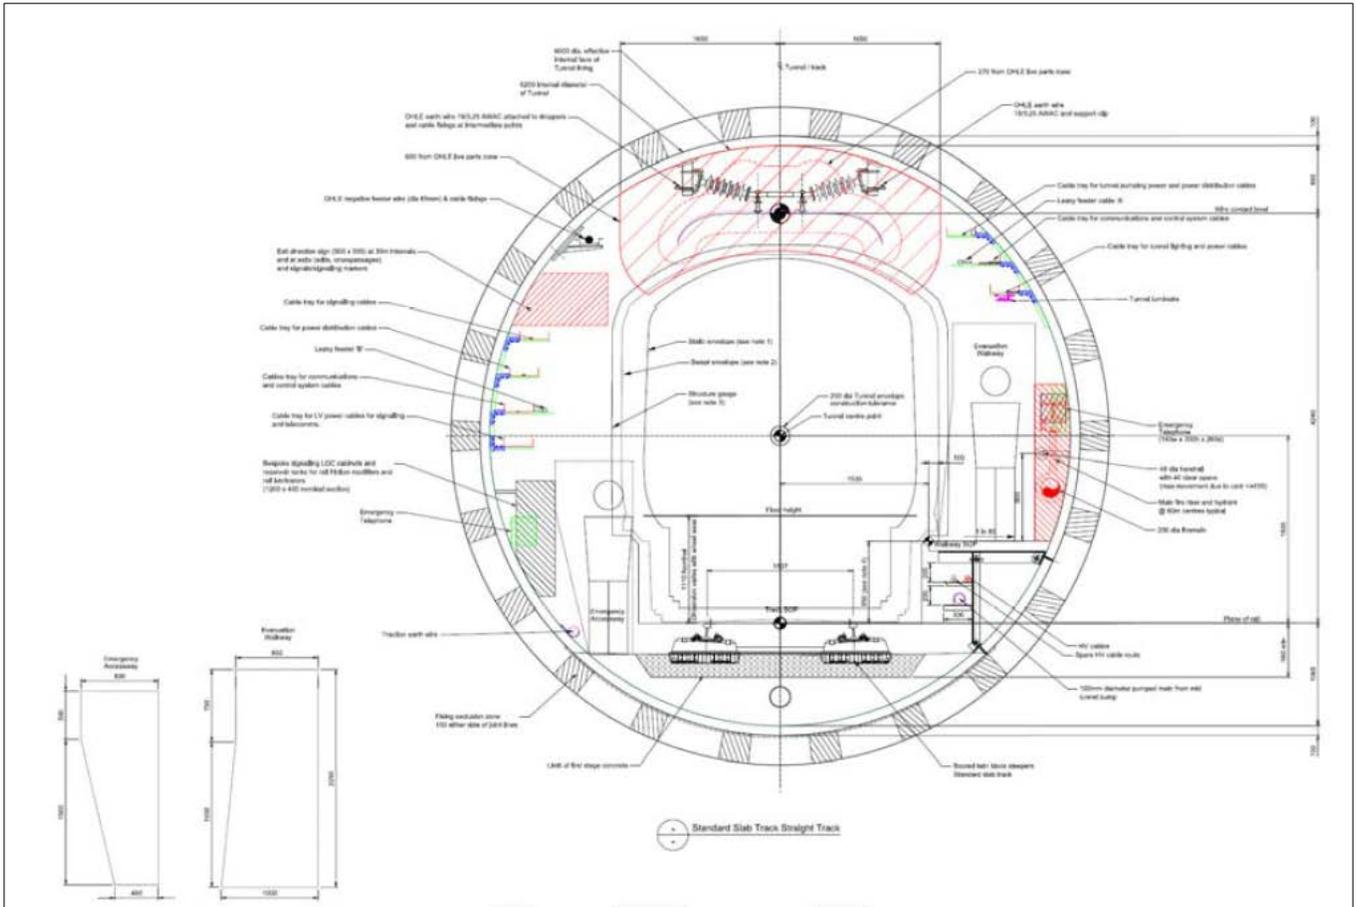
Typical TBM Tunnel (courtesy of LIRR)
